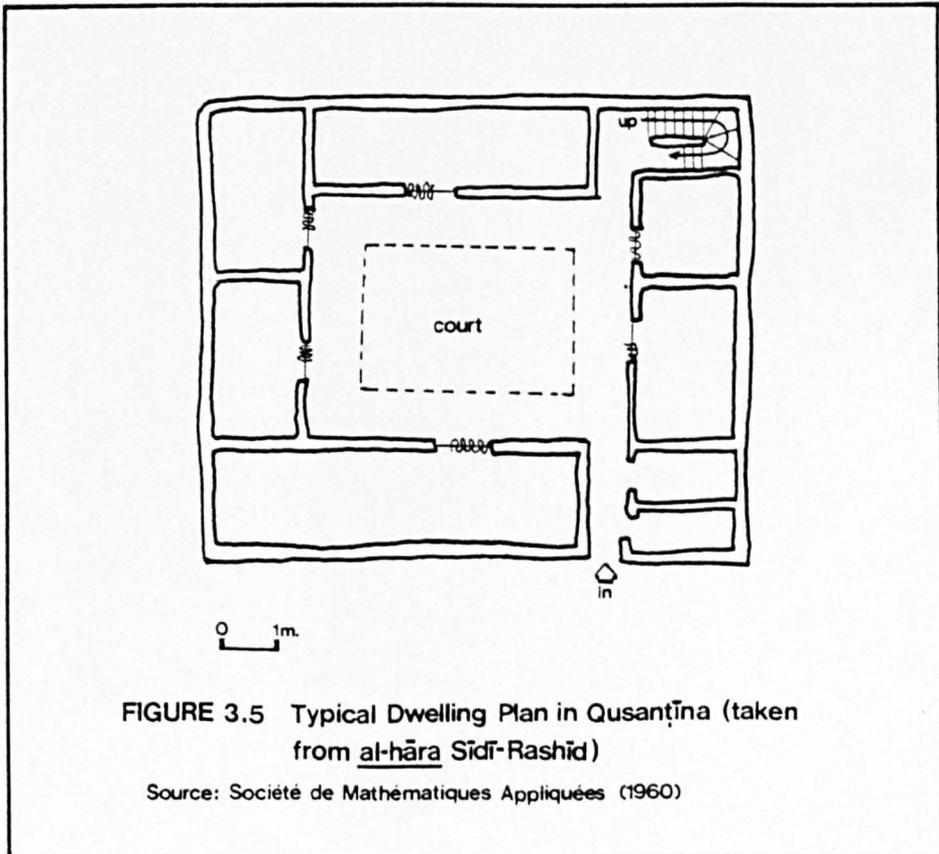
Typical Dwelling Plan in Qusanṭīna (taken from al-hāra Sidī-Rashīd)
